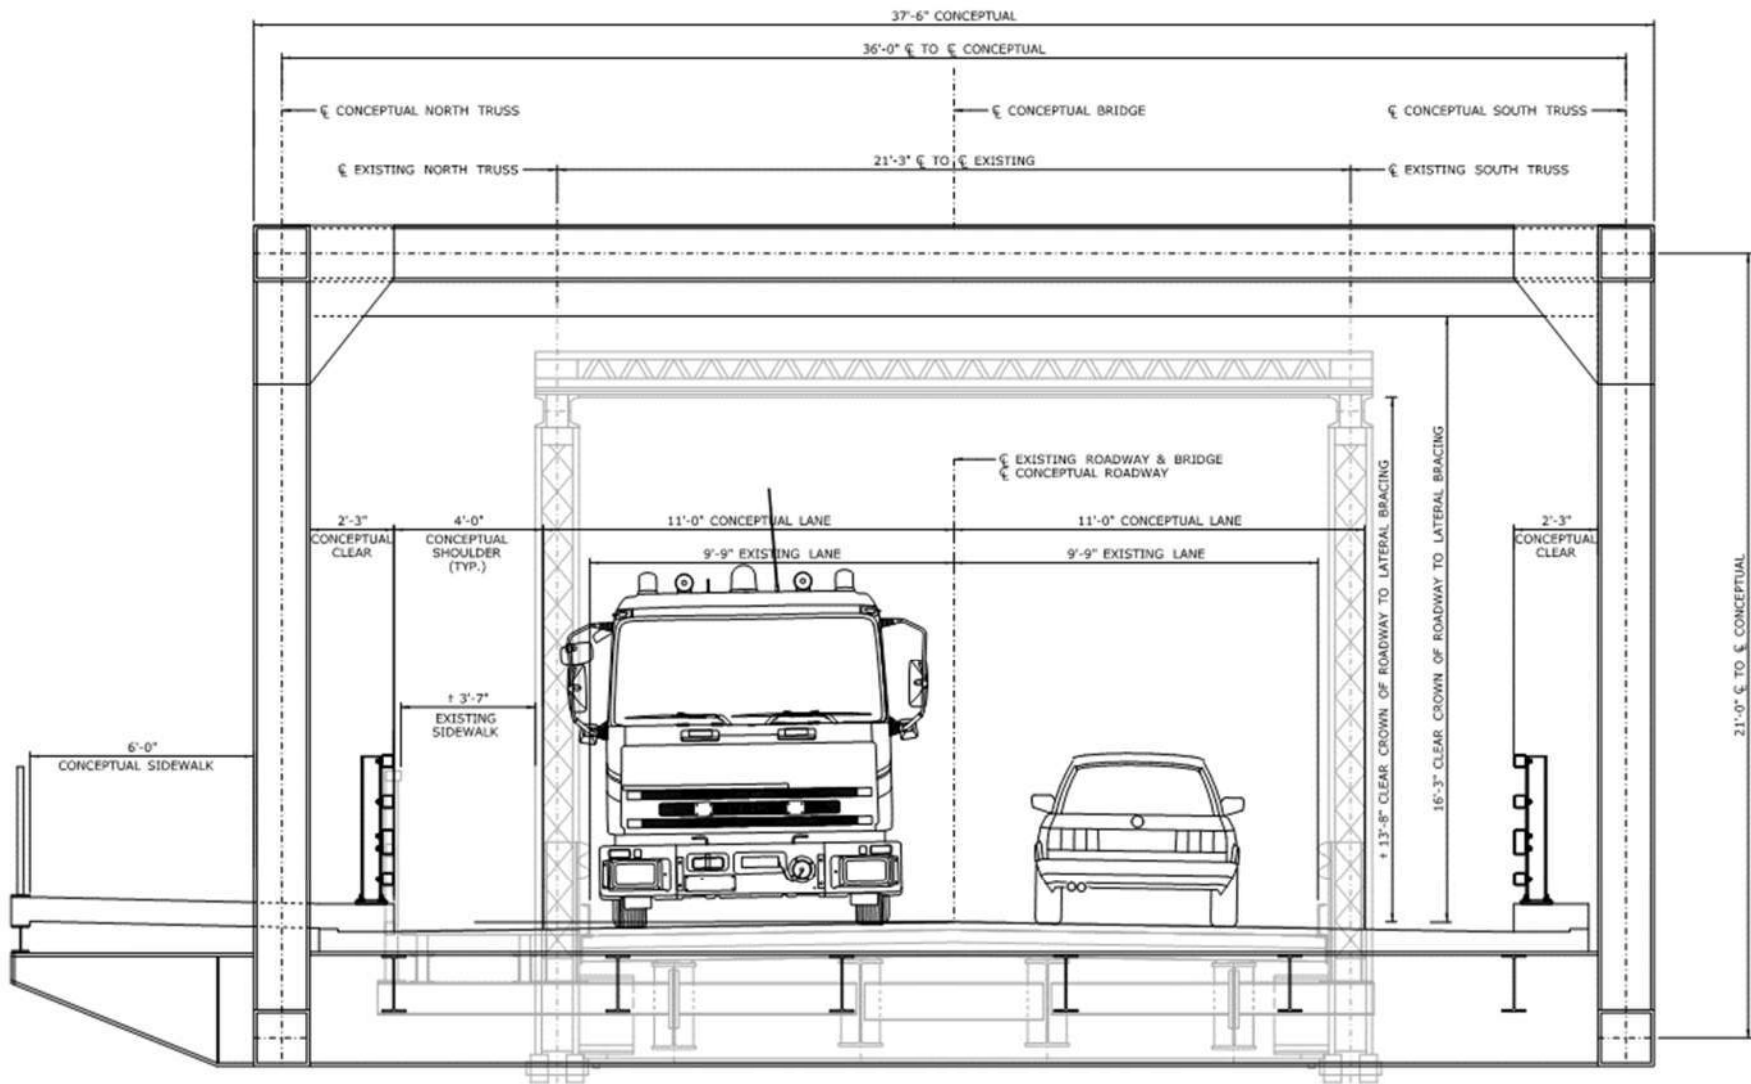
Conceptual section of replacement bridge superimposed on a section of the existing Bridge #01349 (shown in light grey).
